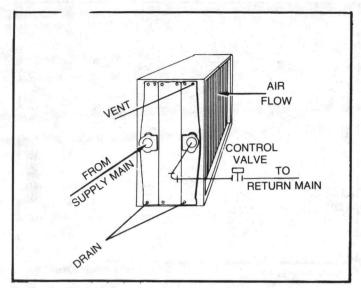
Typical Piping for Type DD Water Cooling Coil with Center Connections.
